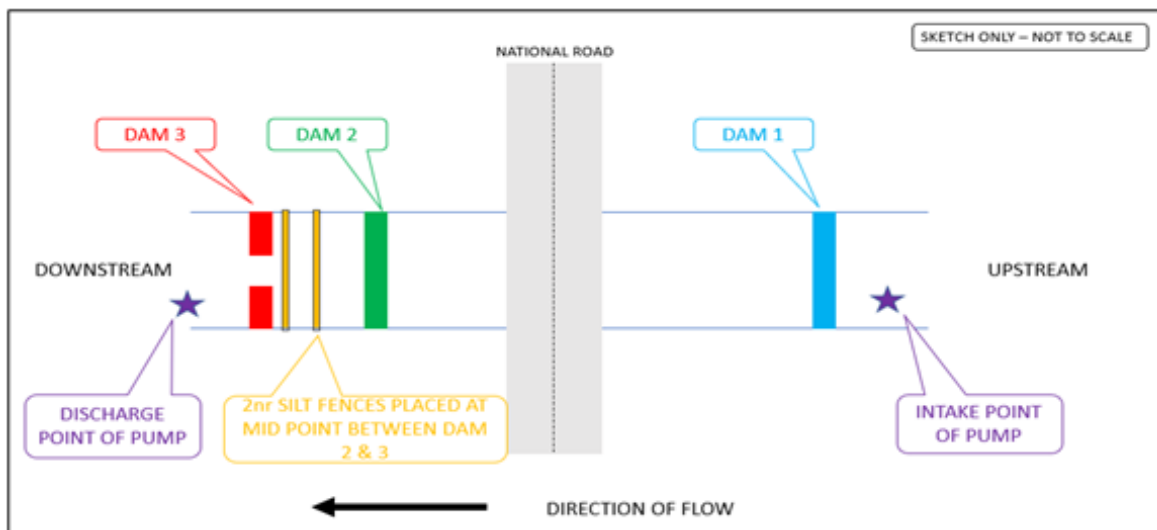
Schematic of the 3-no. dam dewatering system proposed at Strade River Bridge.
